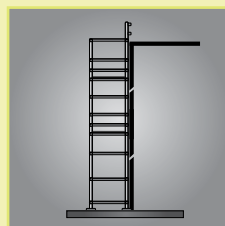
(f) Inside standards supporting guardrailing adjacent to a flat roof structure.
